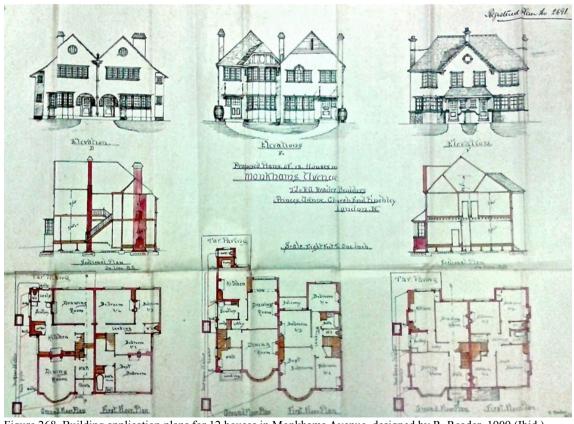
Building application plans for 12 houses in Monkhams Avenue, designed by R. Reader, 1909 (Ibid.)
